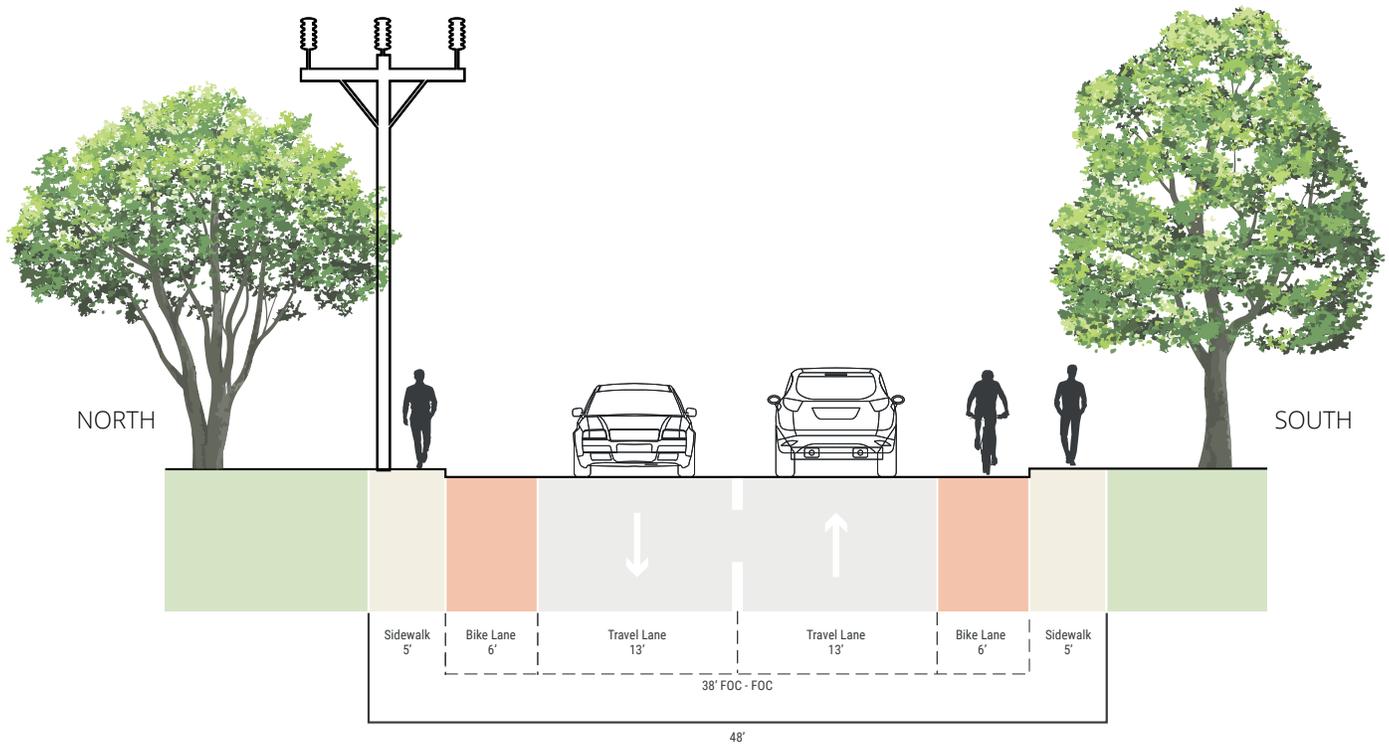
EXISTING 7TH STREET / CHESTNUT STREET CROSS-SECTION
